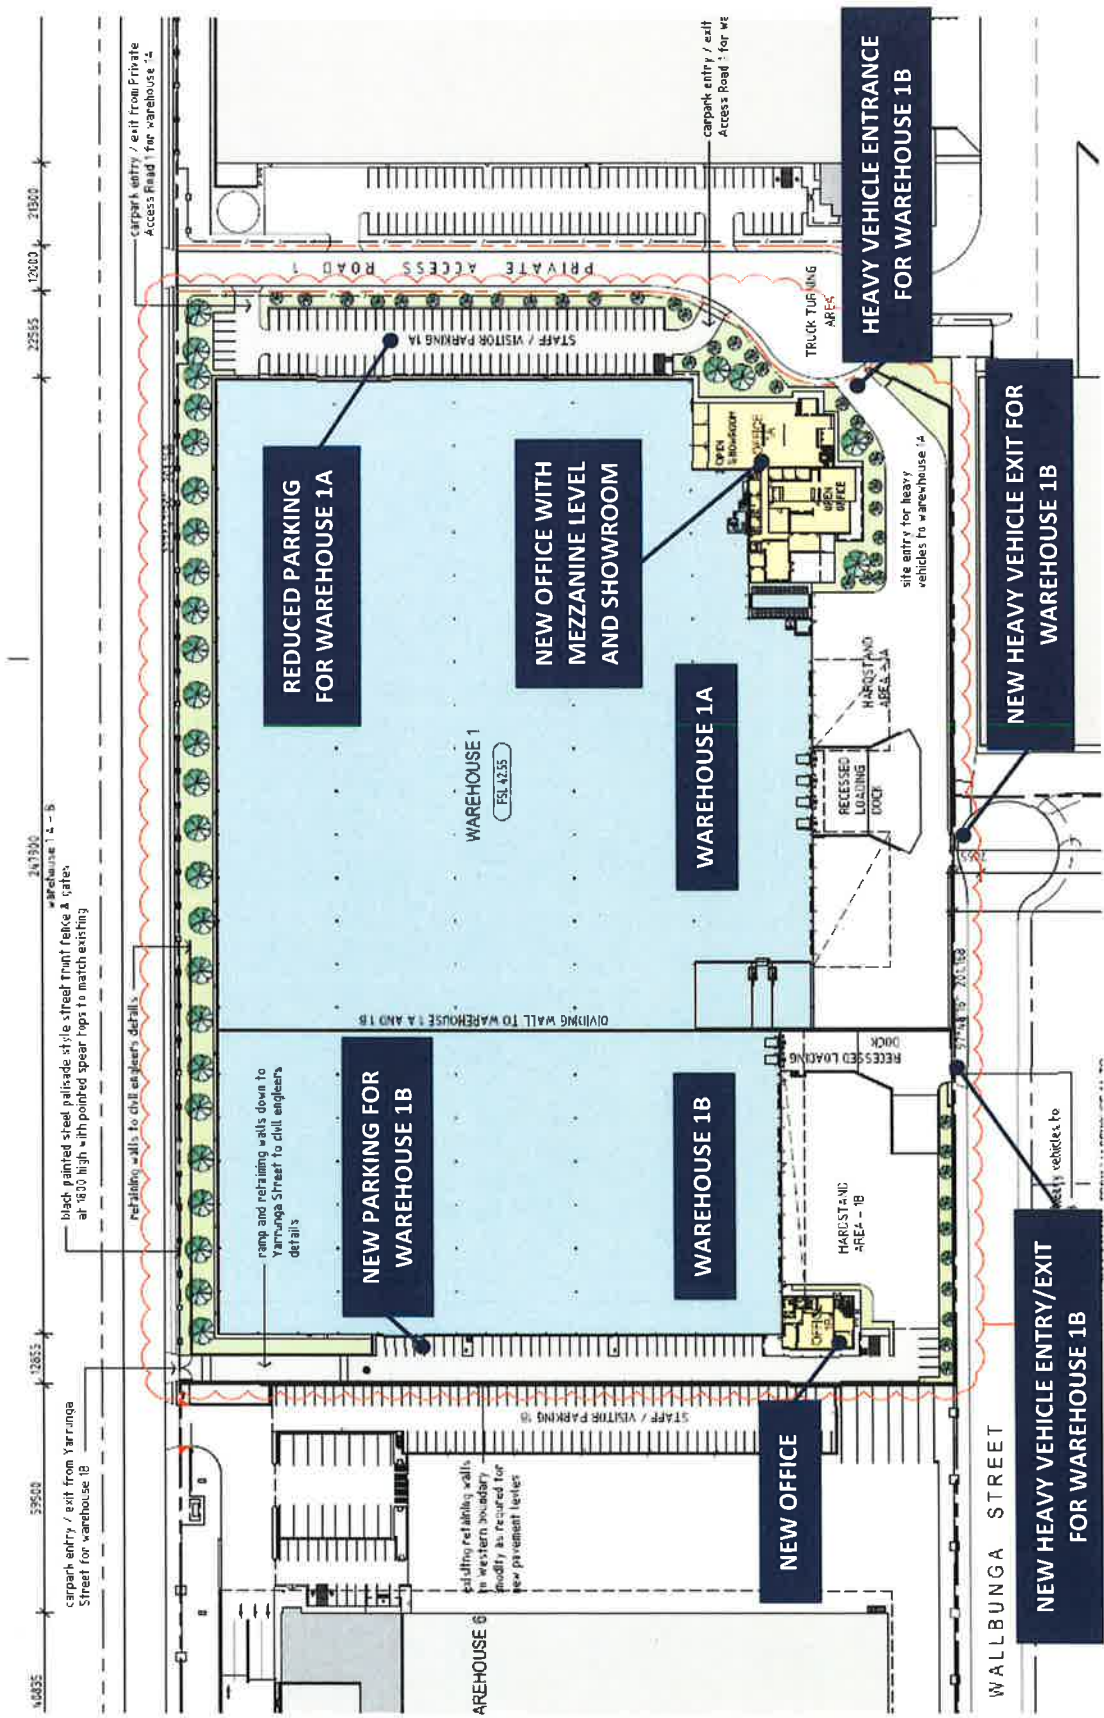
| Detailed Site Plan under SSD 7155 MOD 7
